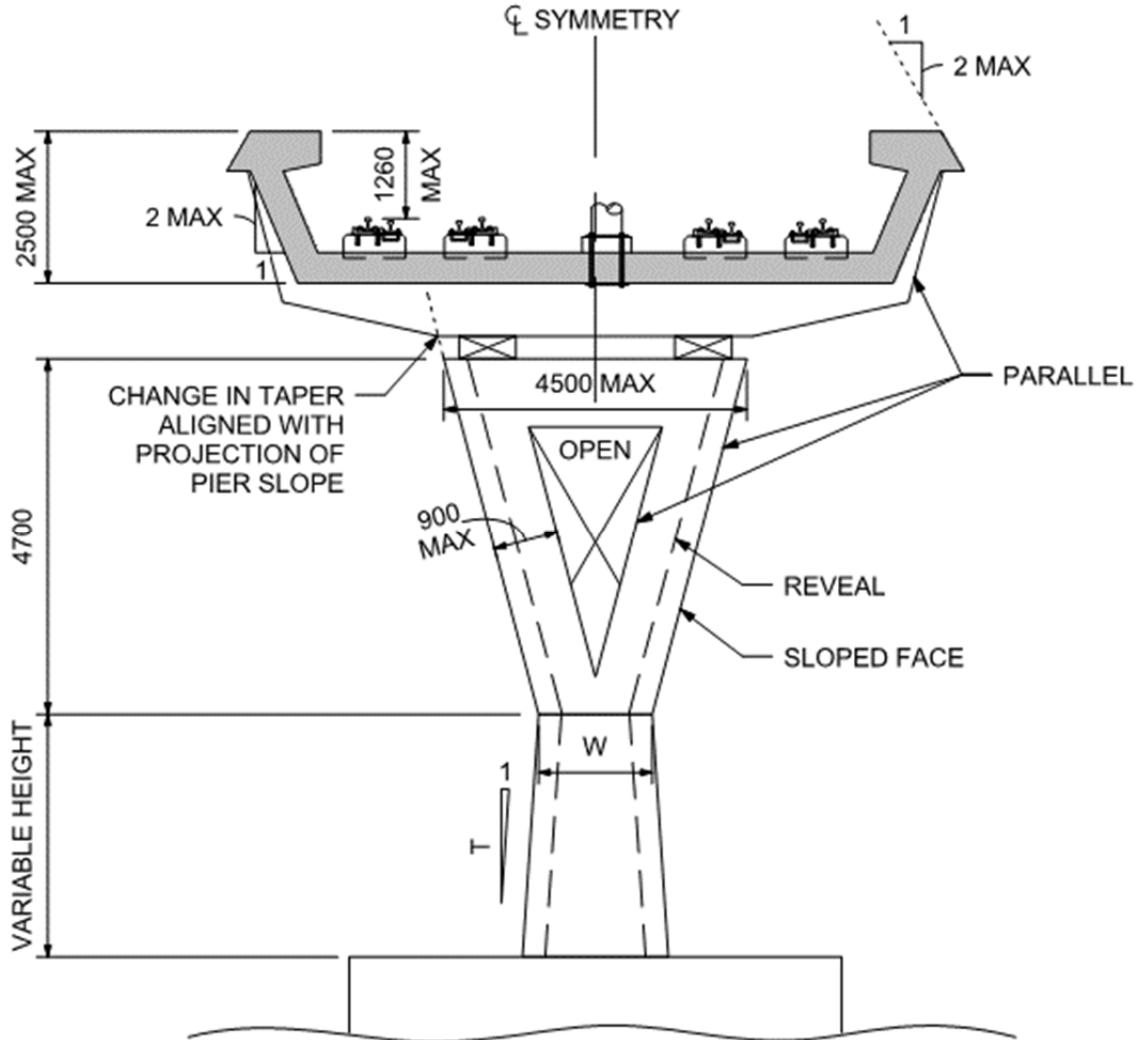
B: Davies Elevated Guideway Section – Trough Girder (dimensions in mm)
